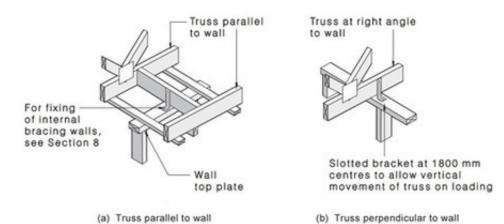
FIXING OF TRUSSES TO A NON-LOADBEARING INTERNAL WALL
